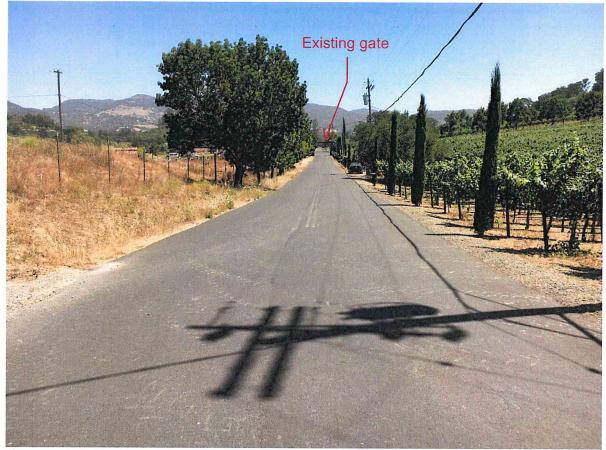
taken from curve in Rapp Lane looking south towards the existing gate.
